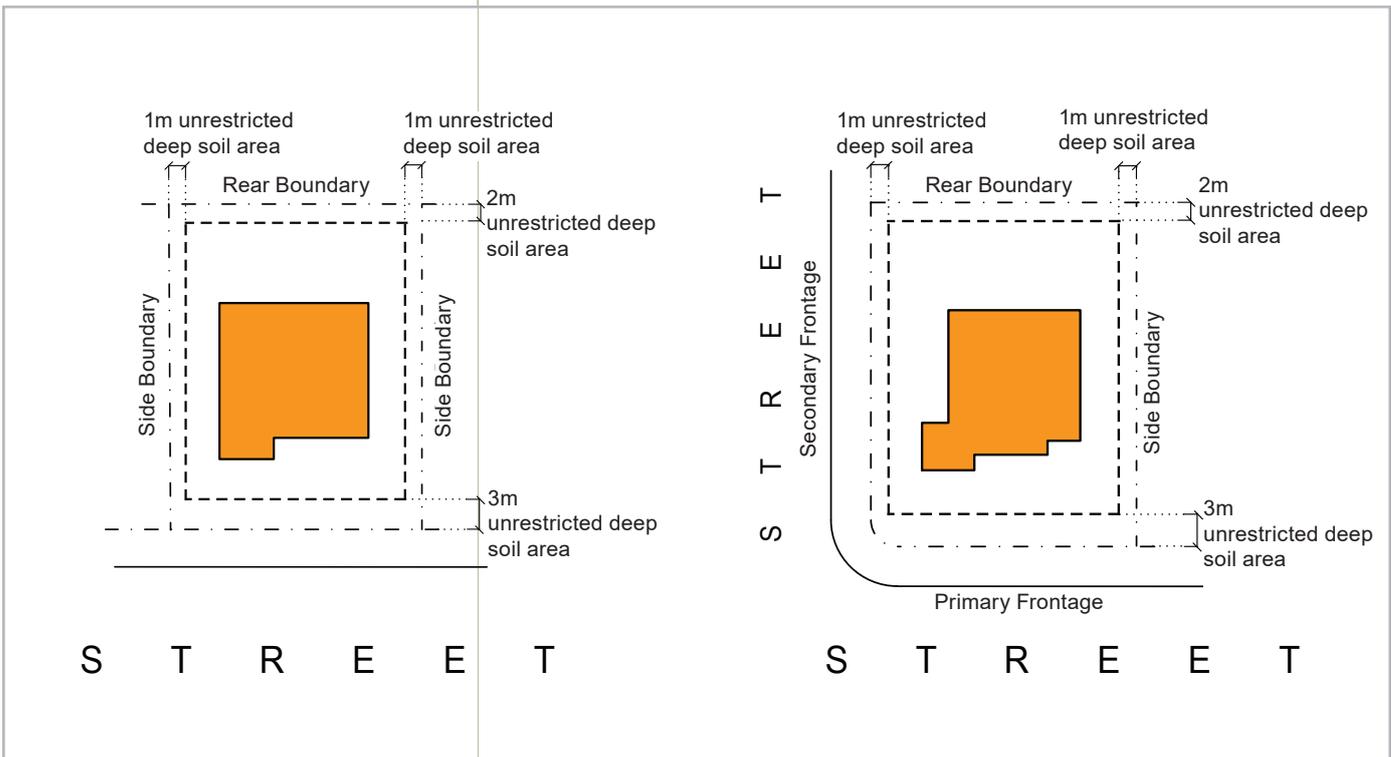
Single frontage sites (left) and corner sites (right): minimum unrestricted deep soil area for low density residential areas
